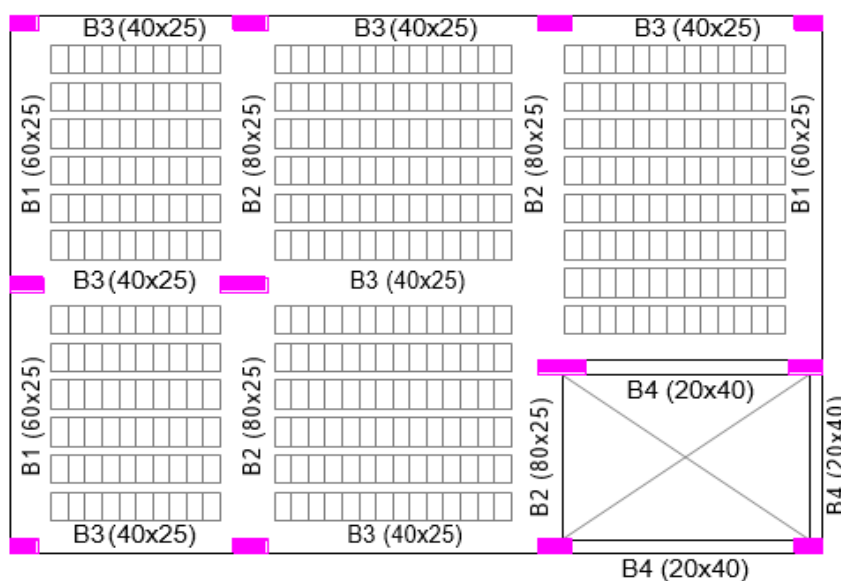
Beams arrangement and dimensions for earthquake resistant building-1.
